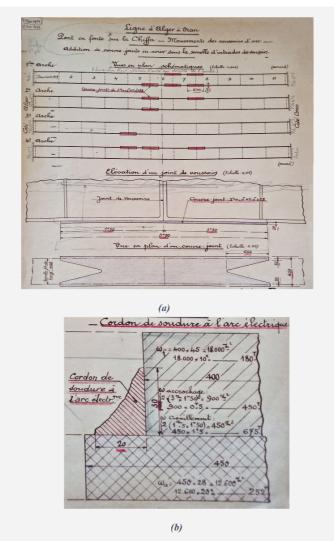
Part of an original document illustrating a schematic view of added steel footings, elevation of a voussoir joint (a), part of the same document illustrating the electric arc welding diagram (1932) (PLM, "Renforcement par des semelles en acier" (Box 352), Archive SNTF, Hussein Dey, Algeria) (b).
